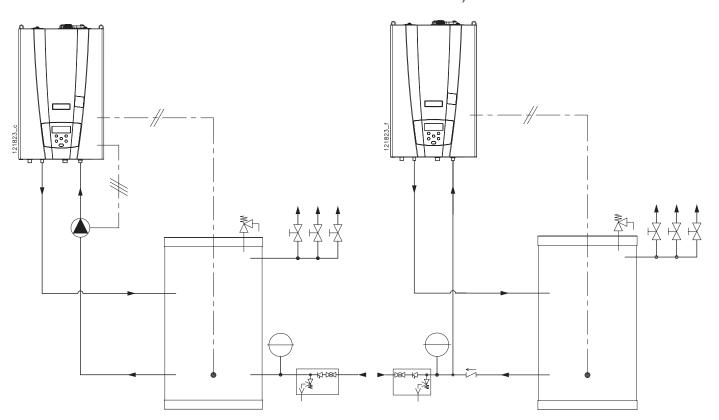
Example of installation with storage tank (see section 5.13)
